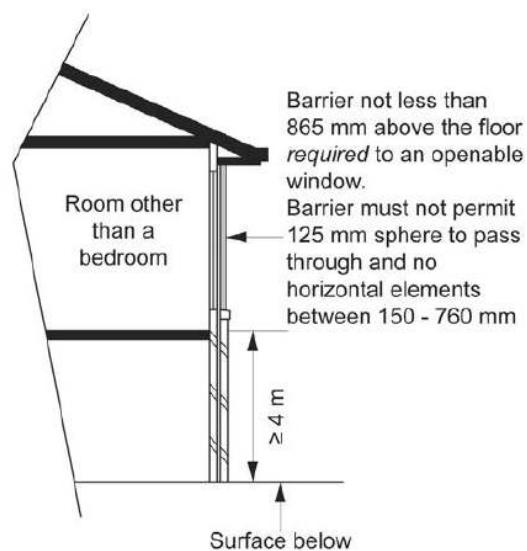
Protection of openable windows - rooms other than bedrooms
